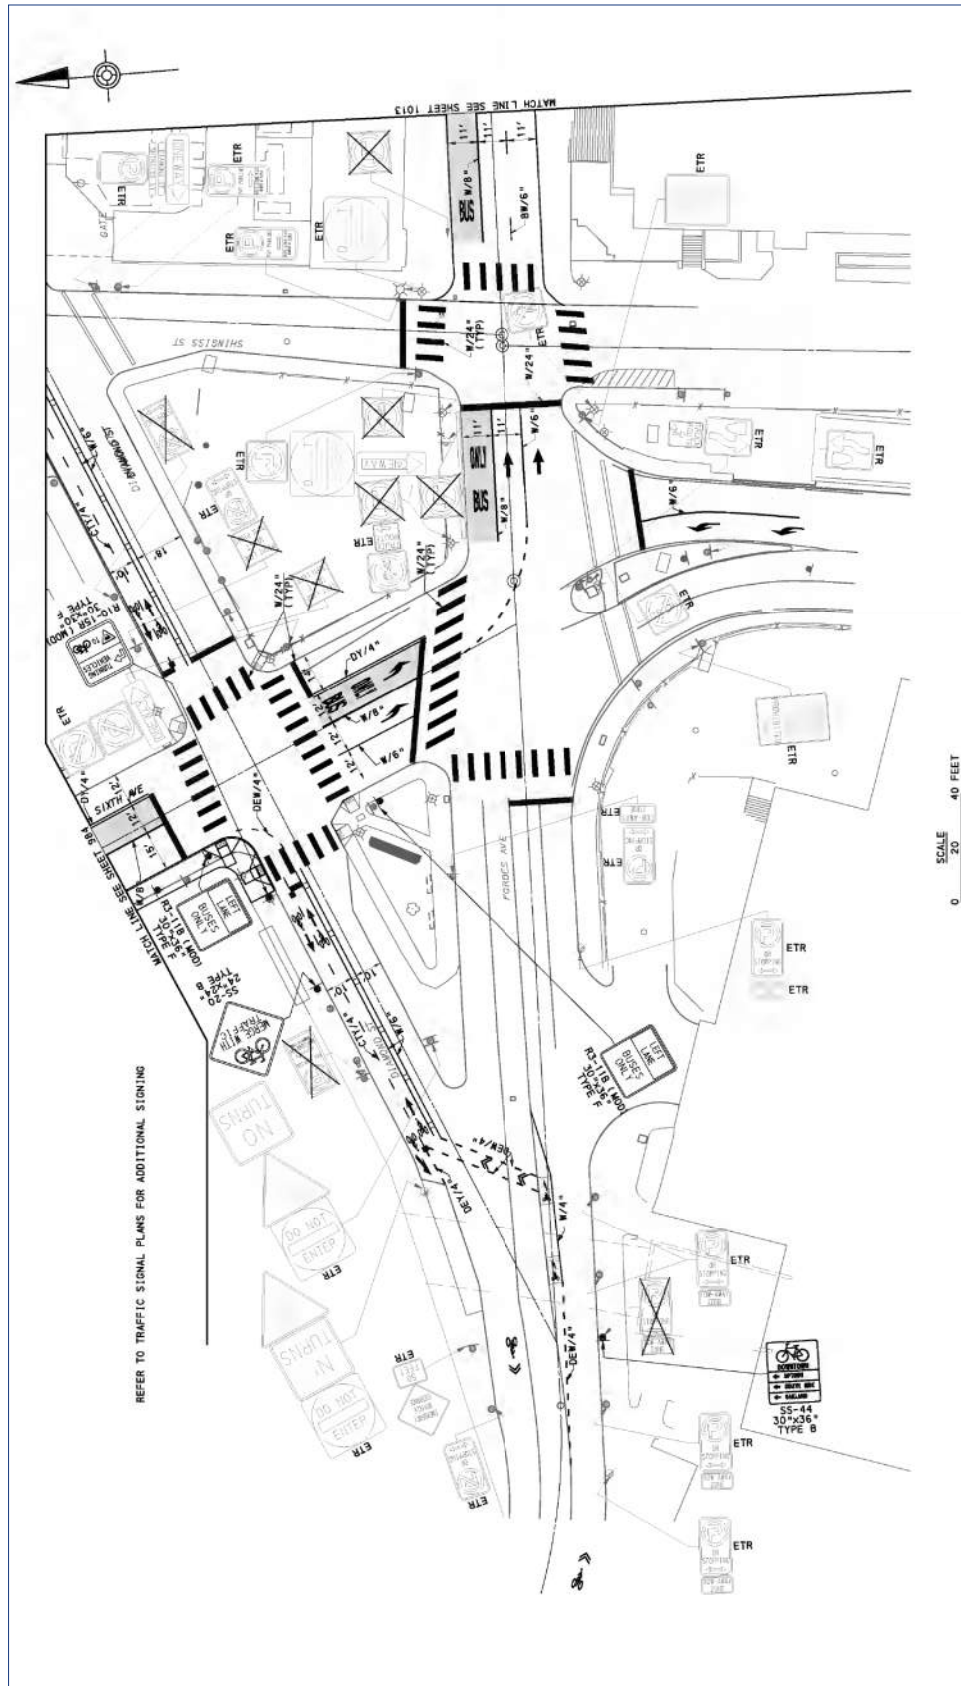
Sixth Avenue and Forbes Avenue and Liberty Bridge Ramps
